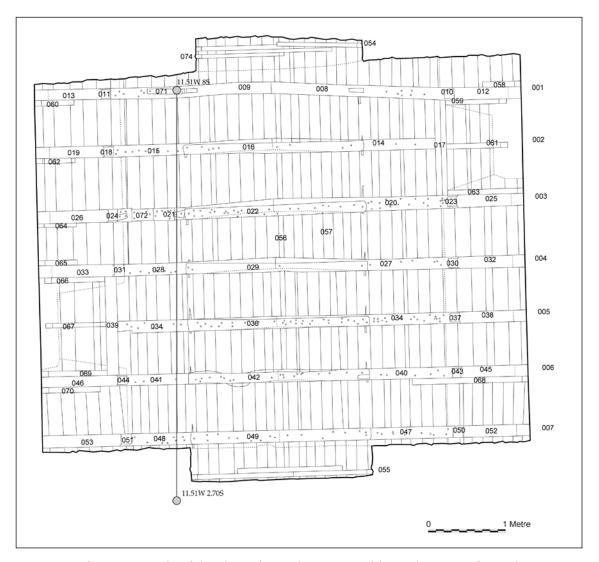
Underside Plan of Gatehouse Roof (N to bottom of page)
